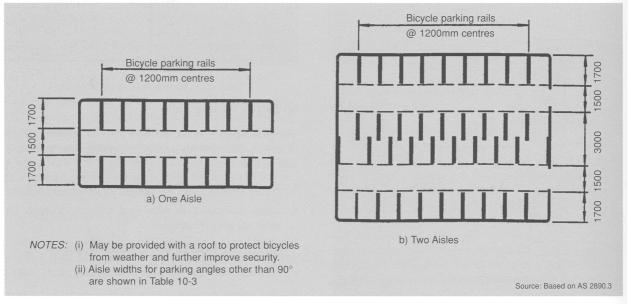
Typical Open Plan Storage Layouts Suitable for Schools
